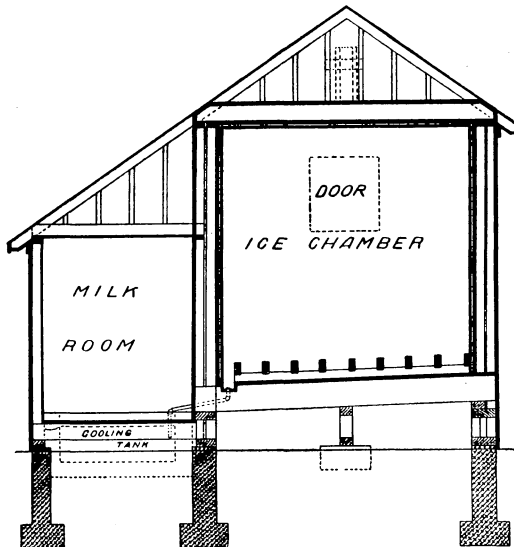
Cross section of ice house and milk room shown in fig. 31.
